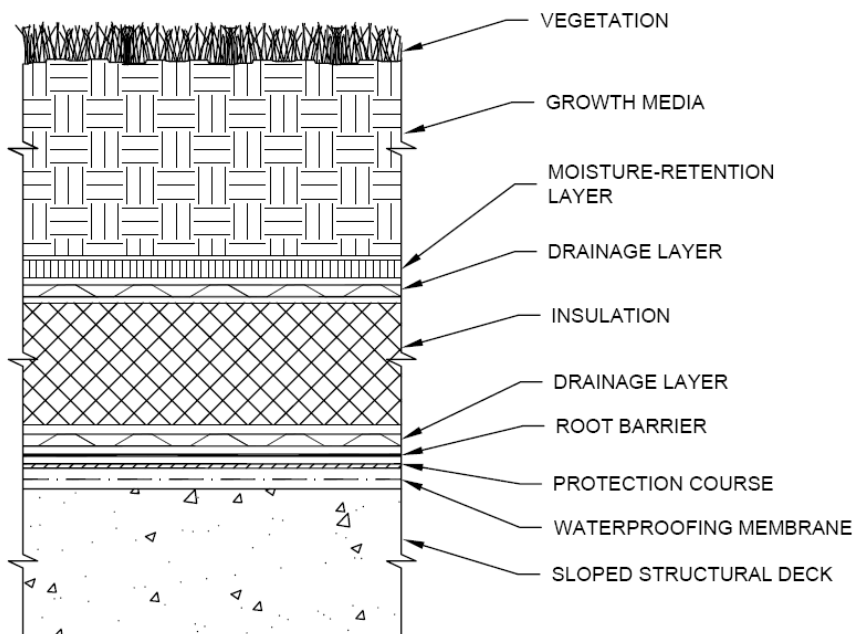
Vegetative roof system with inverted assembly and drainage layers above and below the insulation.
